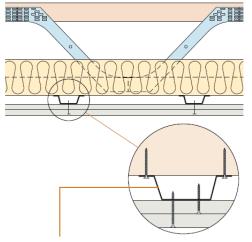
Resilient Bar Ceiling with Secondary Ceiling
